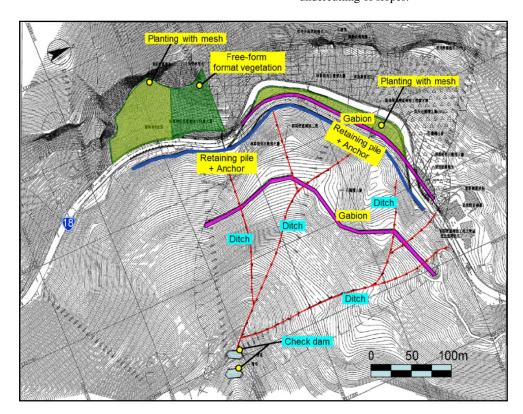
Layout of repair works at Mileage 59.1k of Alishan Route 18
